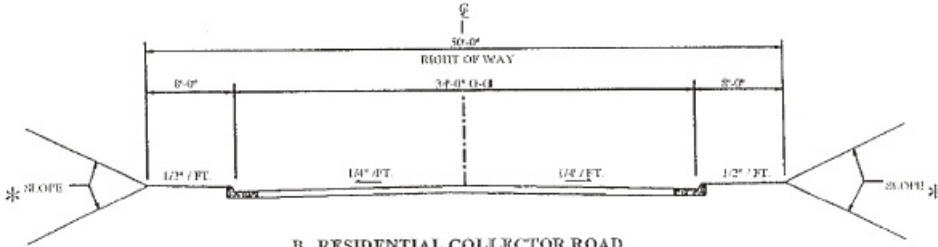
CROSS-SECTION-SHOULDER SECTION
